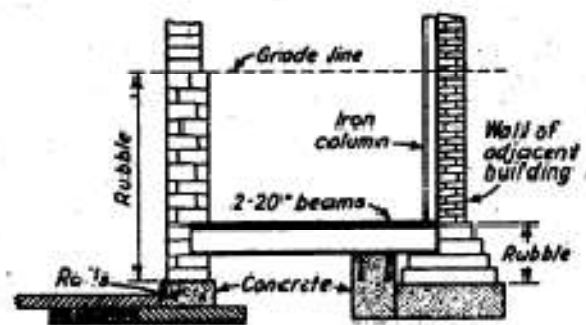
Cantilever footing supporting exterior column of Auditorium Building, Chicago, 1887.
